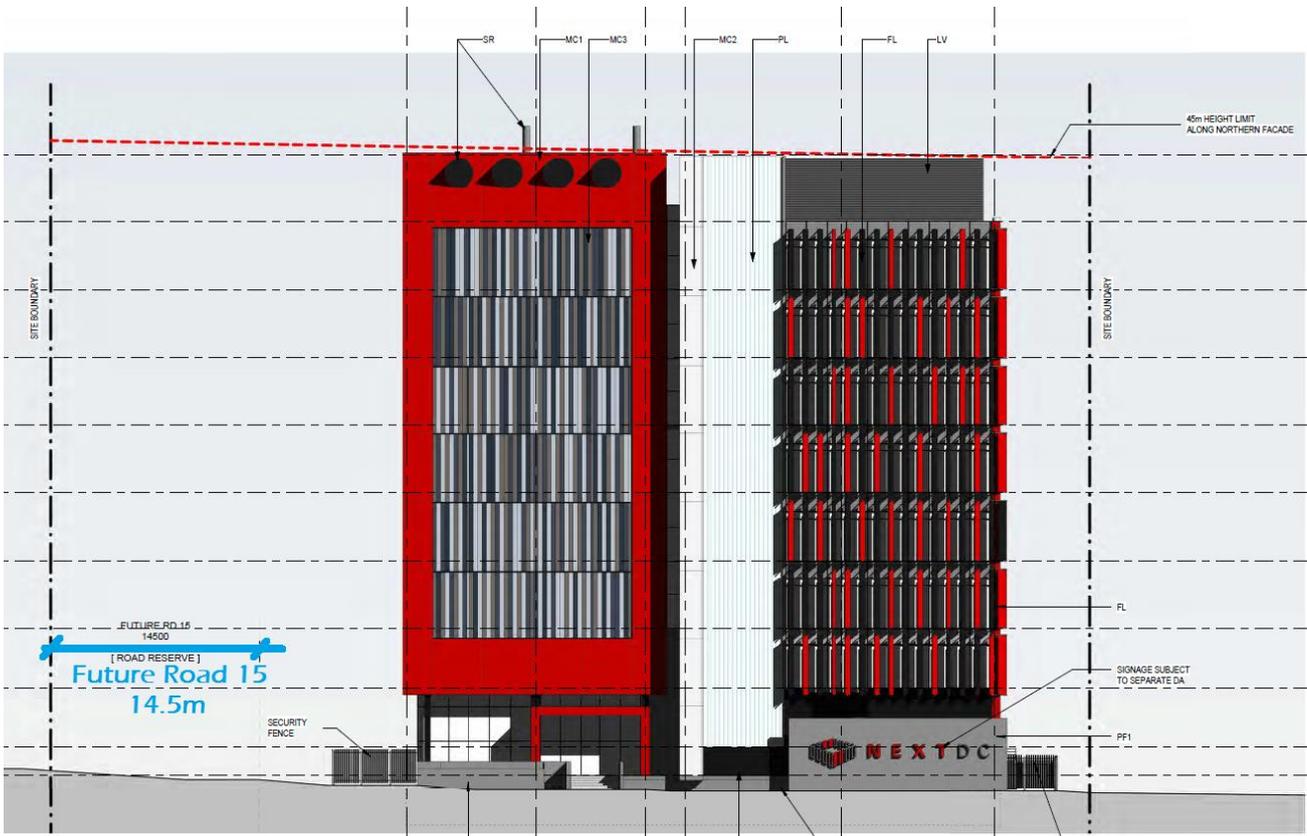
Northern (Giffnock Avenue) elevation plan of the proposed development
